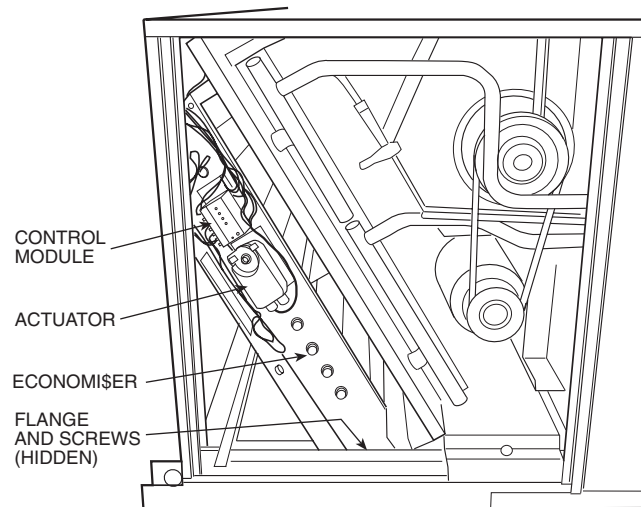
Standard 25% Outdoor-Air Section Details
